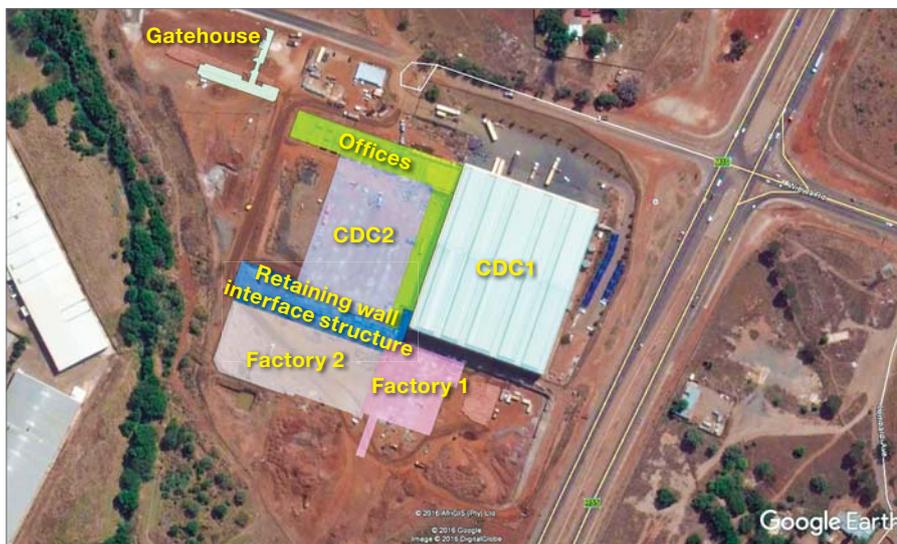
The AMKA factory and warehouse site on the corner of the M10 and R55 arterials in Sunderland Ridge
